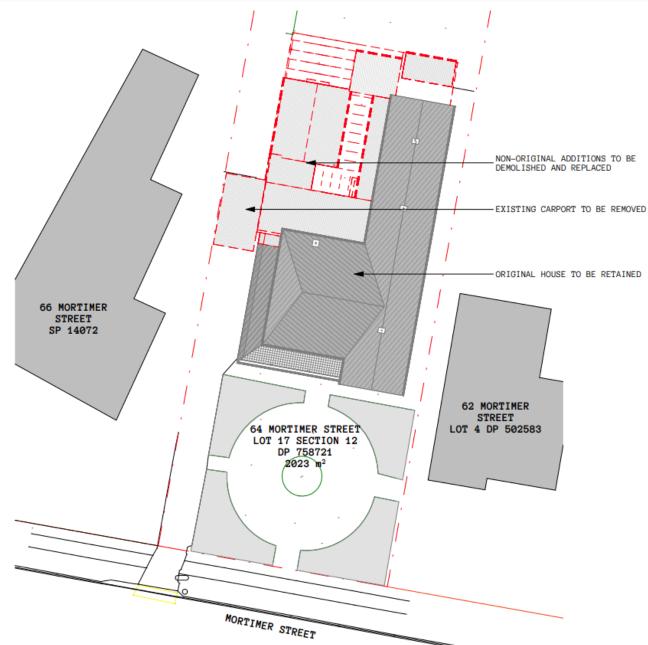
Site plan showing proposed demolition of non-heritage additions
